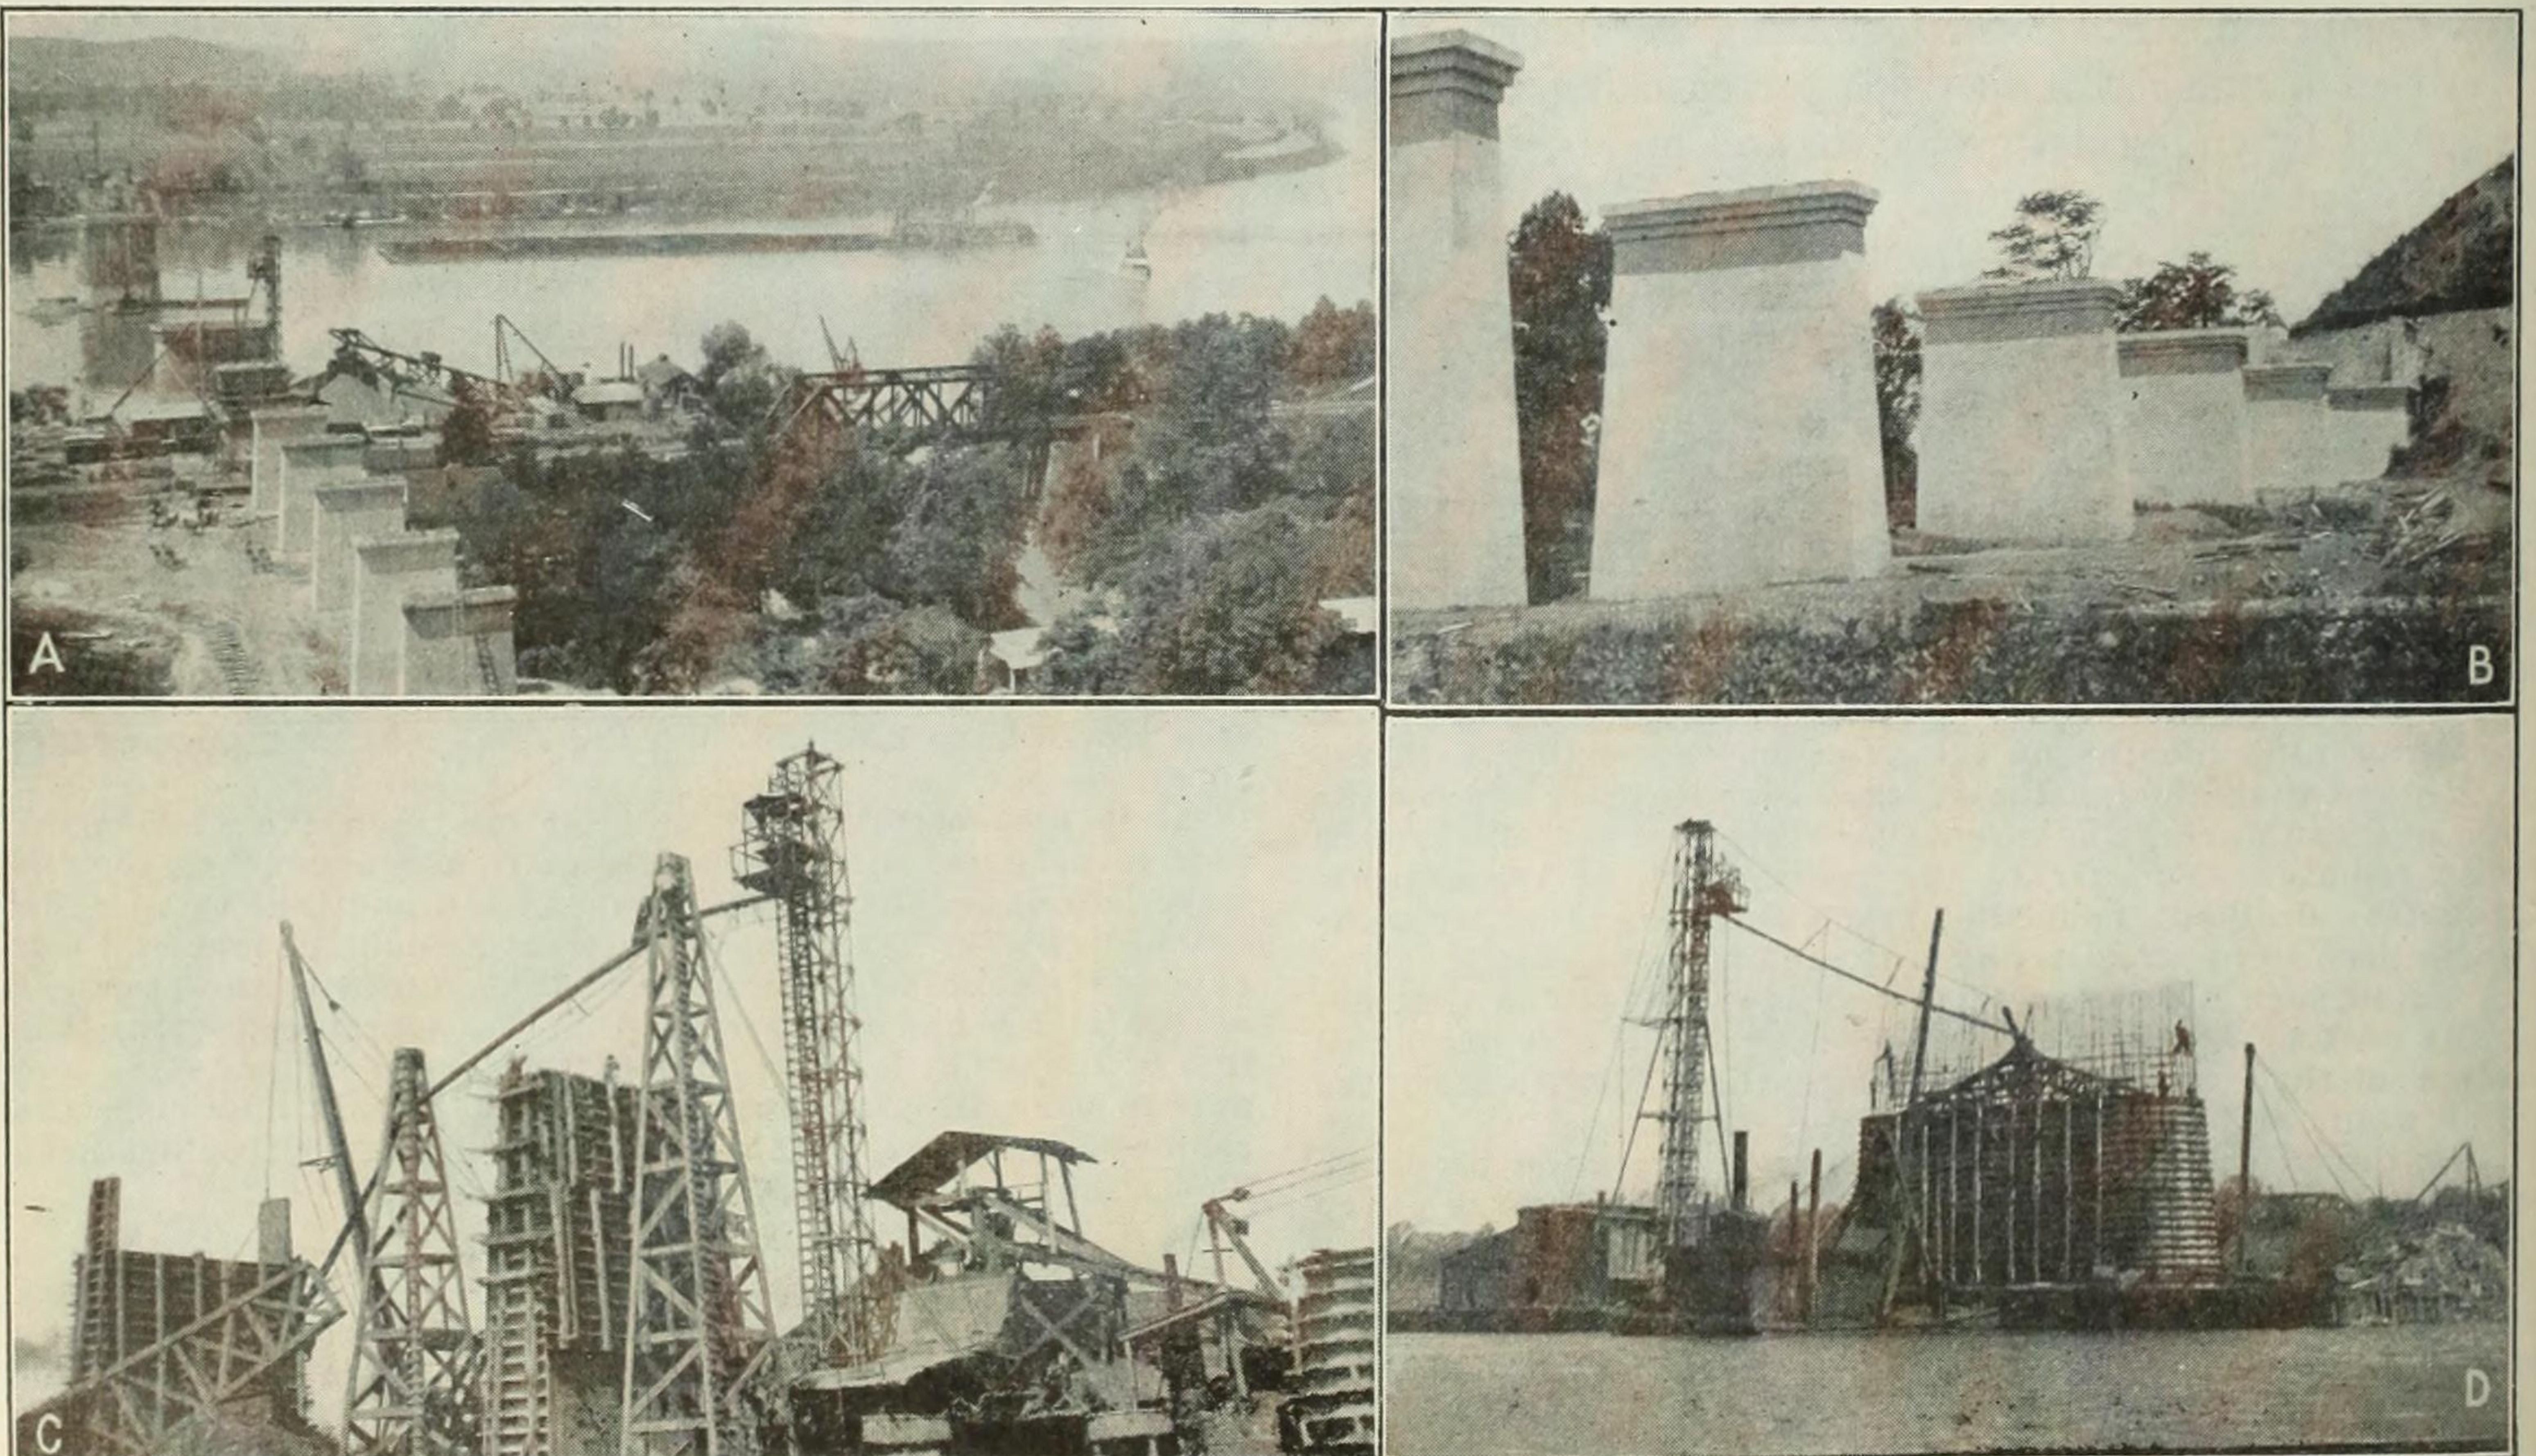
VIEWS OF SCIOTOVILLE BRIDGE PIER CONSTRUCTION
